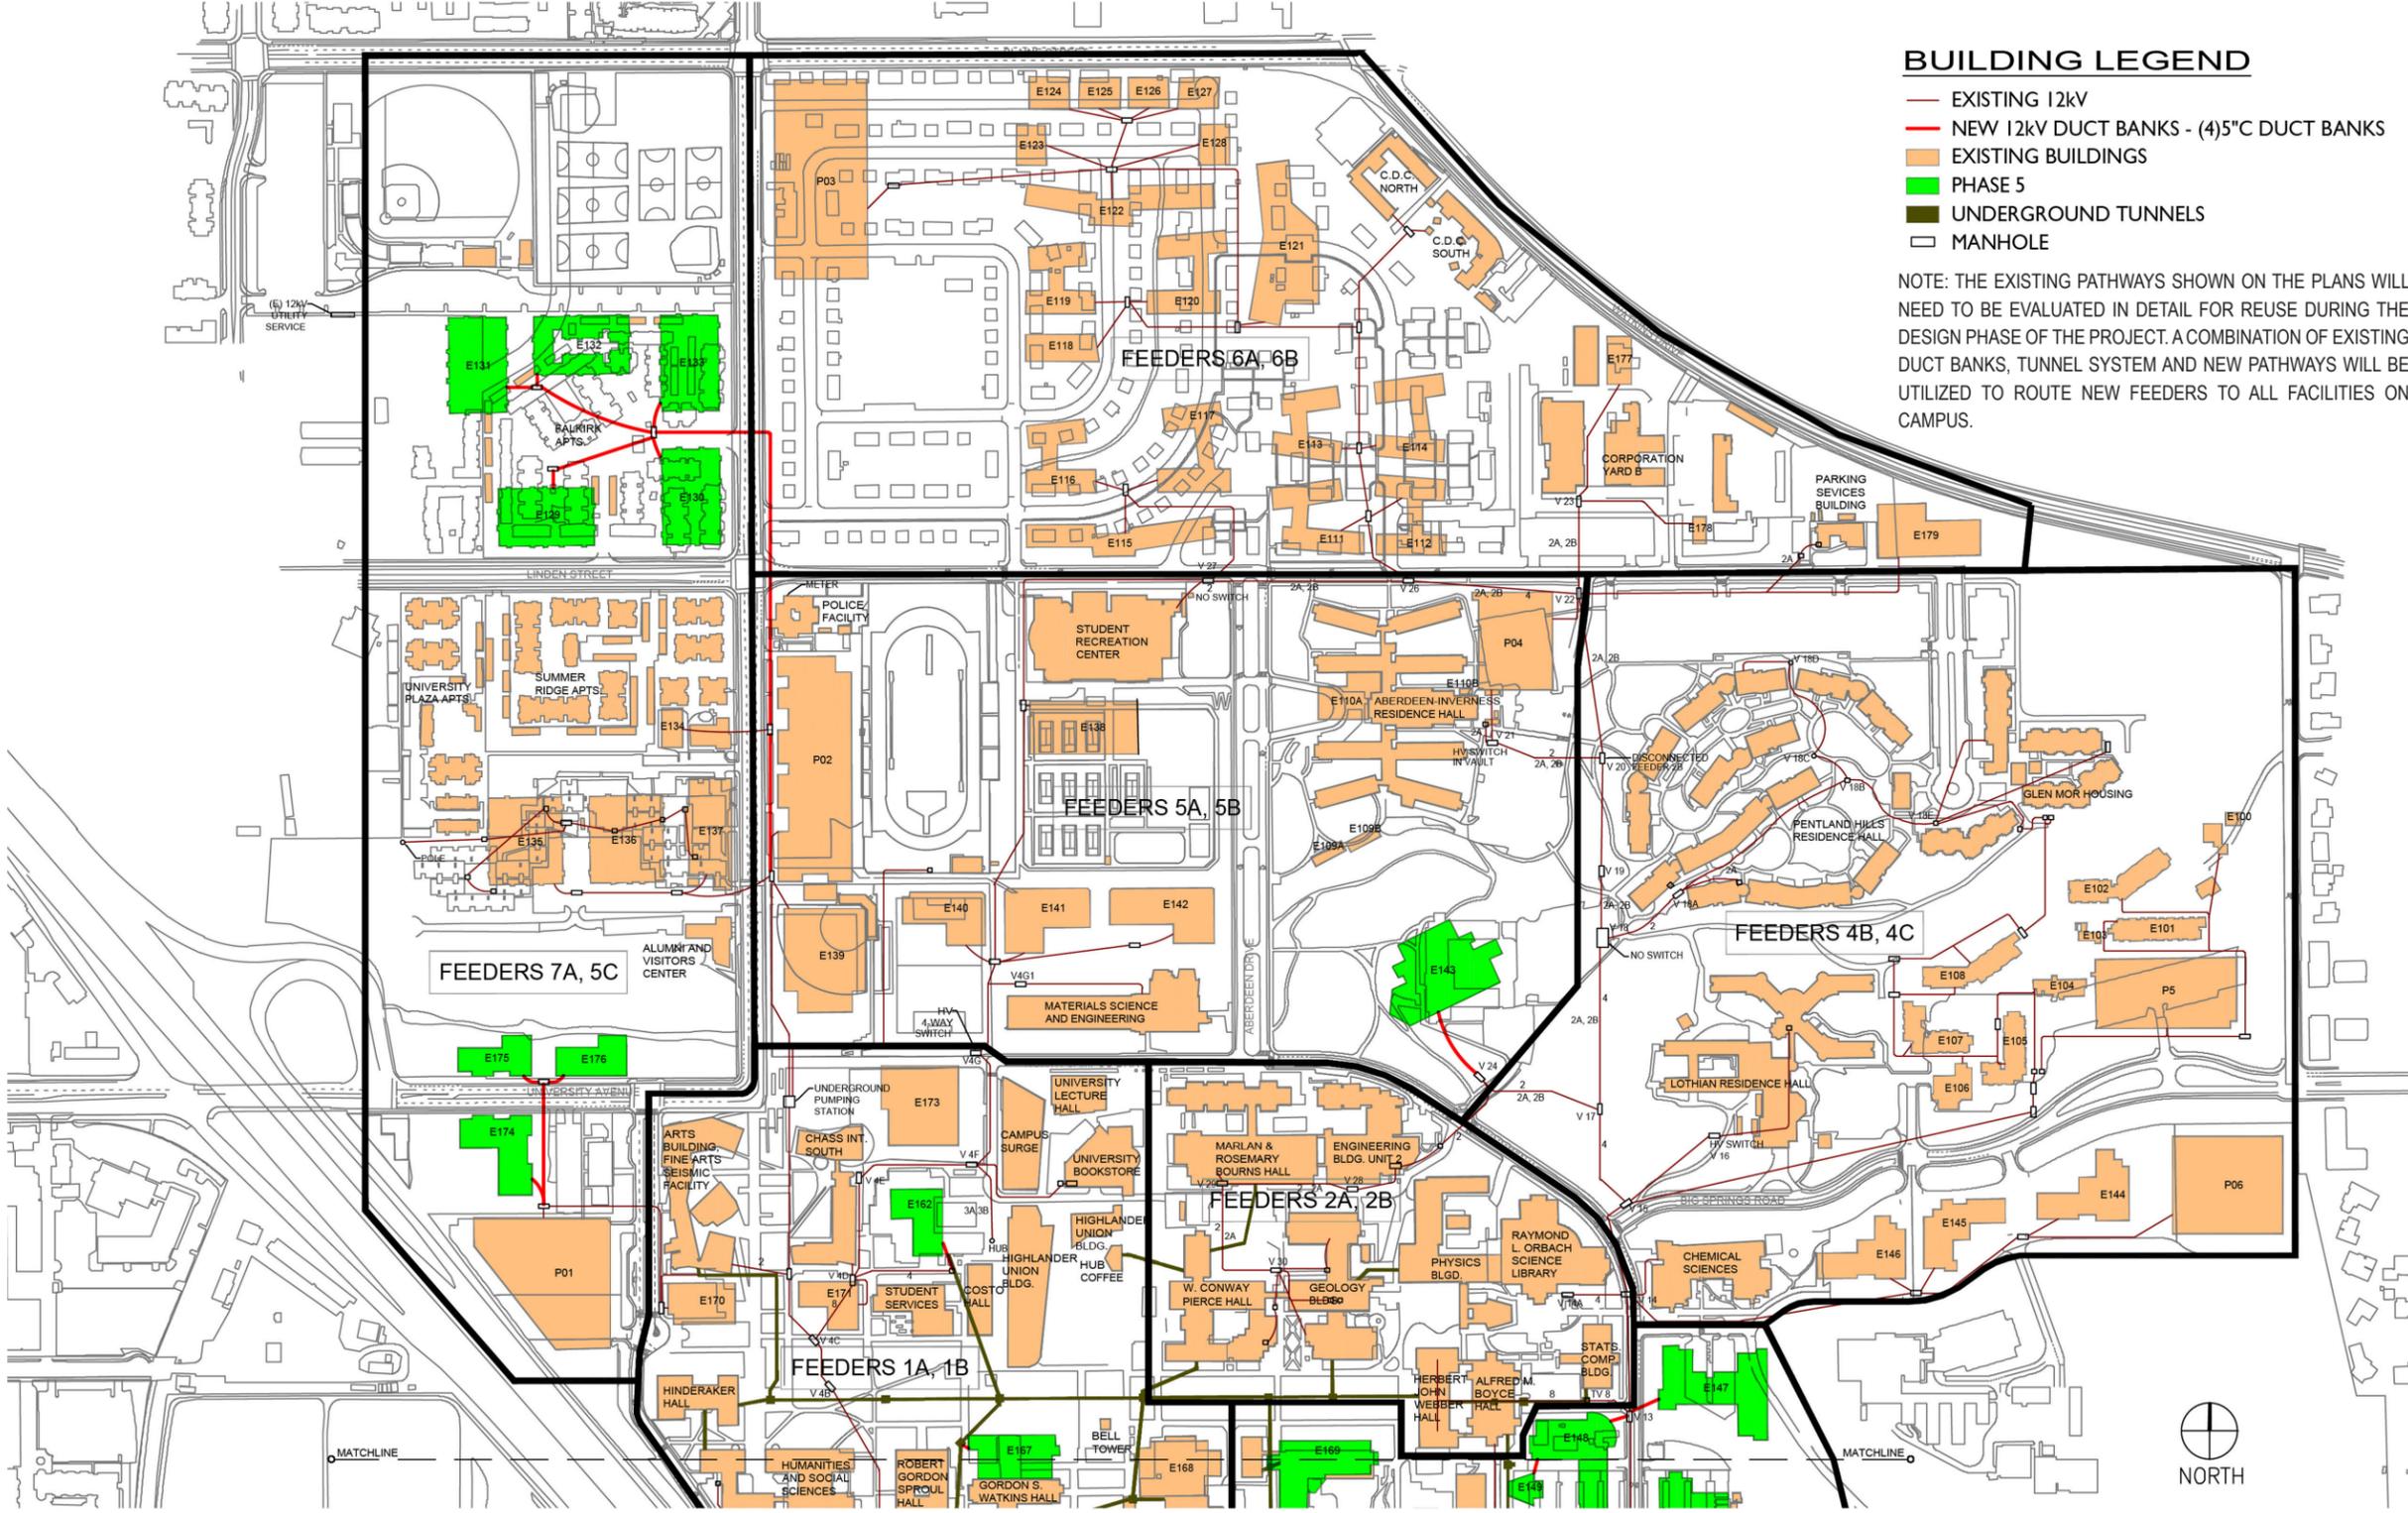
Phase 5 Buildings Electrical Site Plan–North
